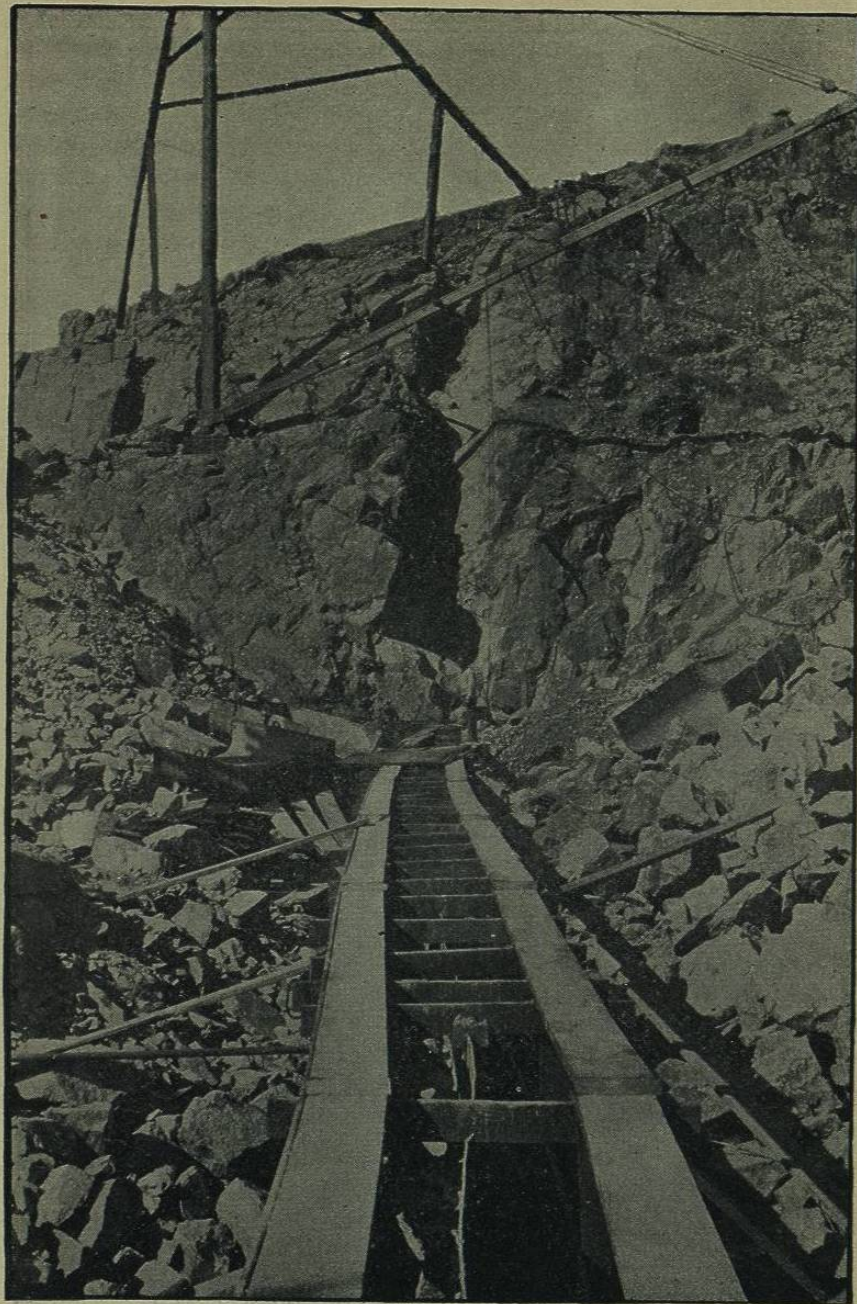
STEEL WEB-PLATE AND ANCHOR-TRENCH AT WEST END OF LOWER OTAY DAM.
